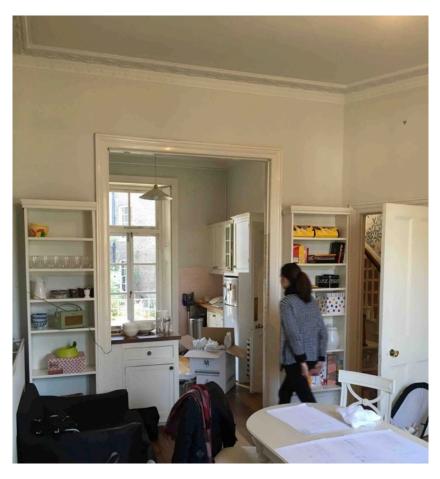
View from existing ground floor Dining Room looking towards Kitchen
